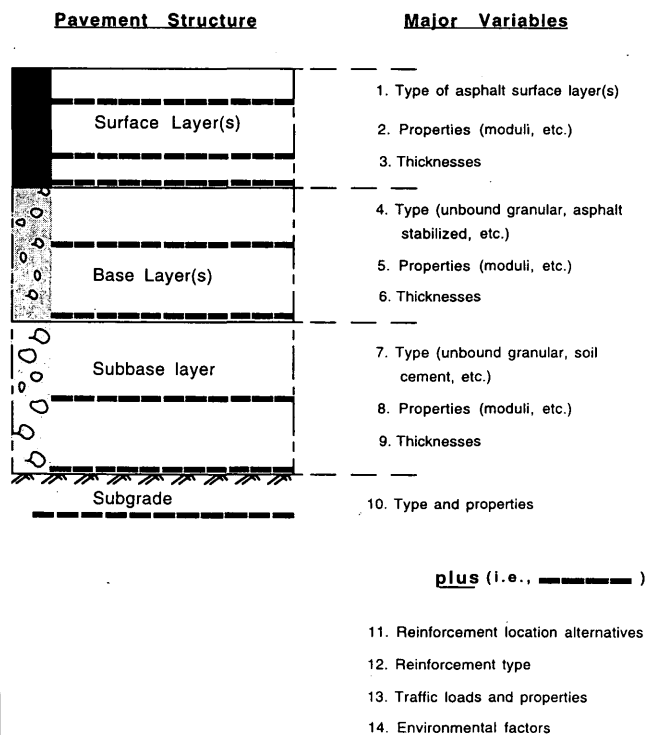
Reinforcement location alternatives and some of the major variables.
